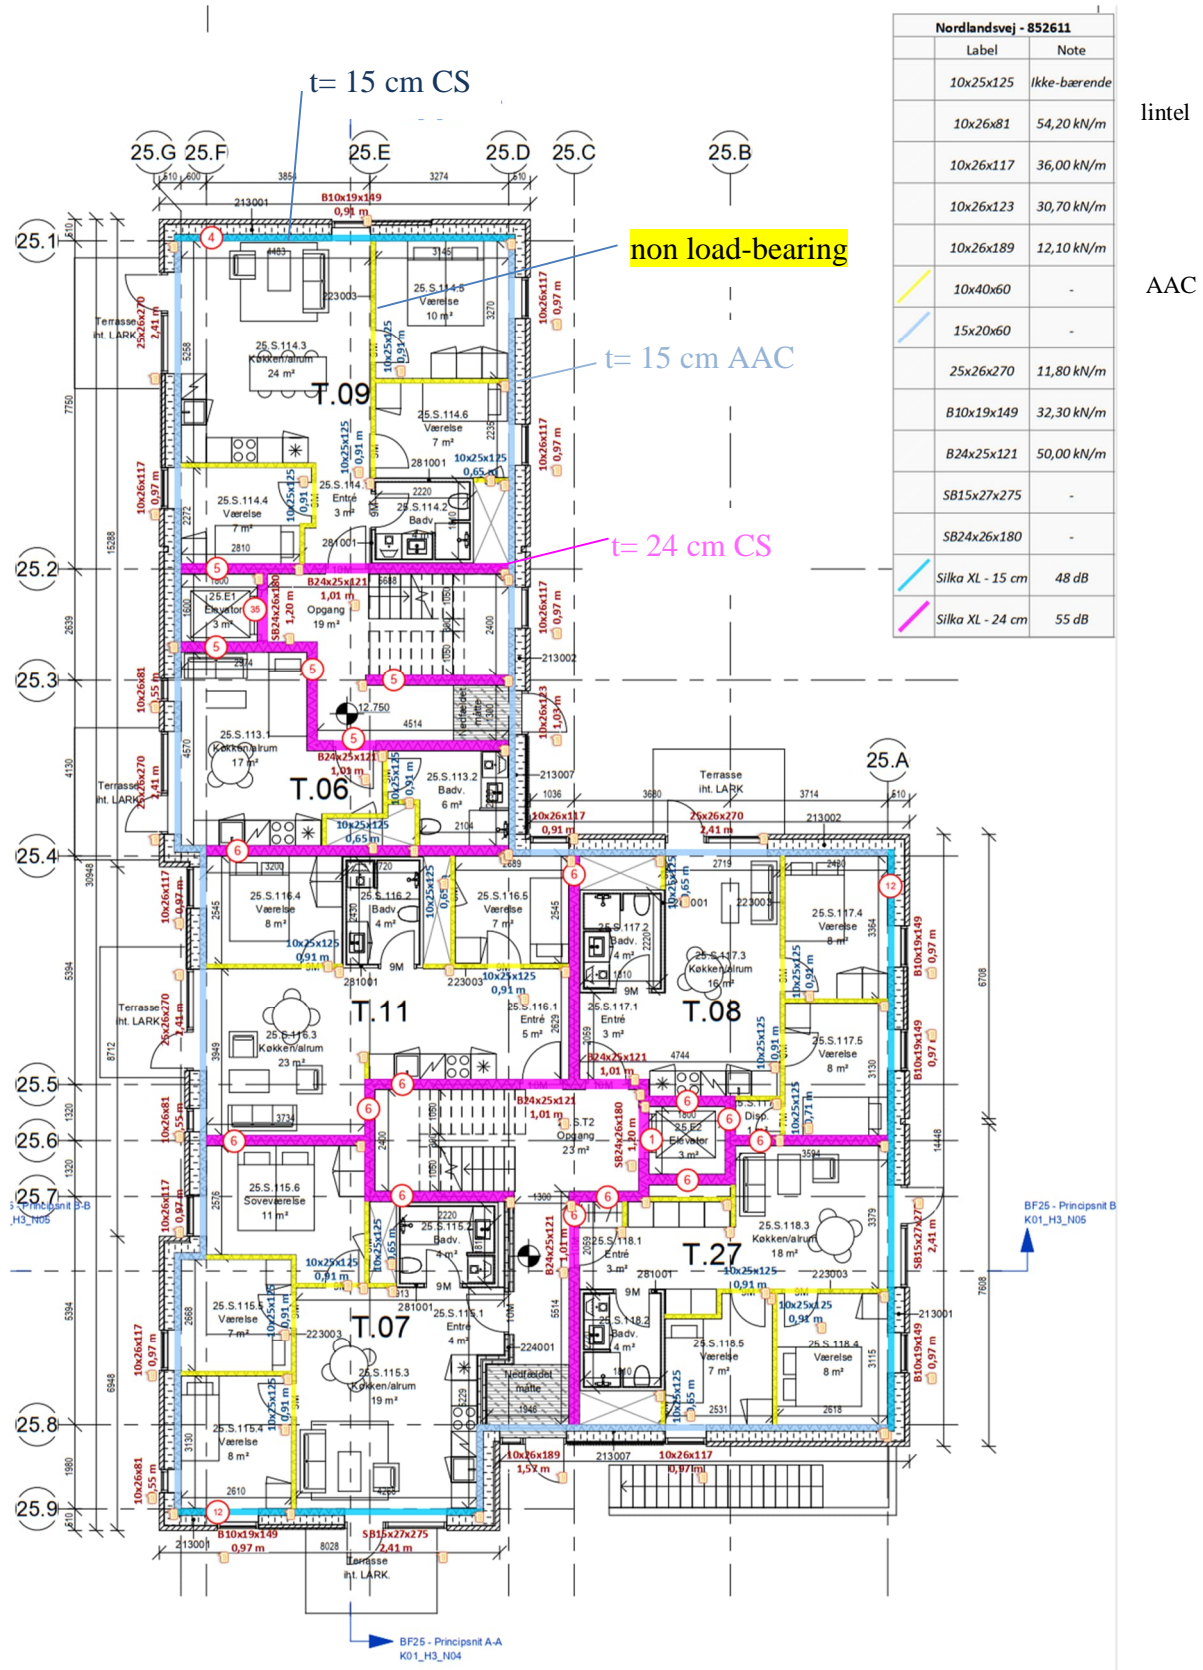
The ground floor of the multi-storey masonry building [D-2].
